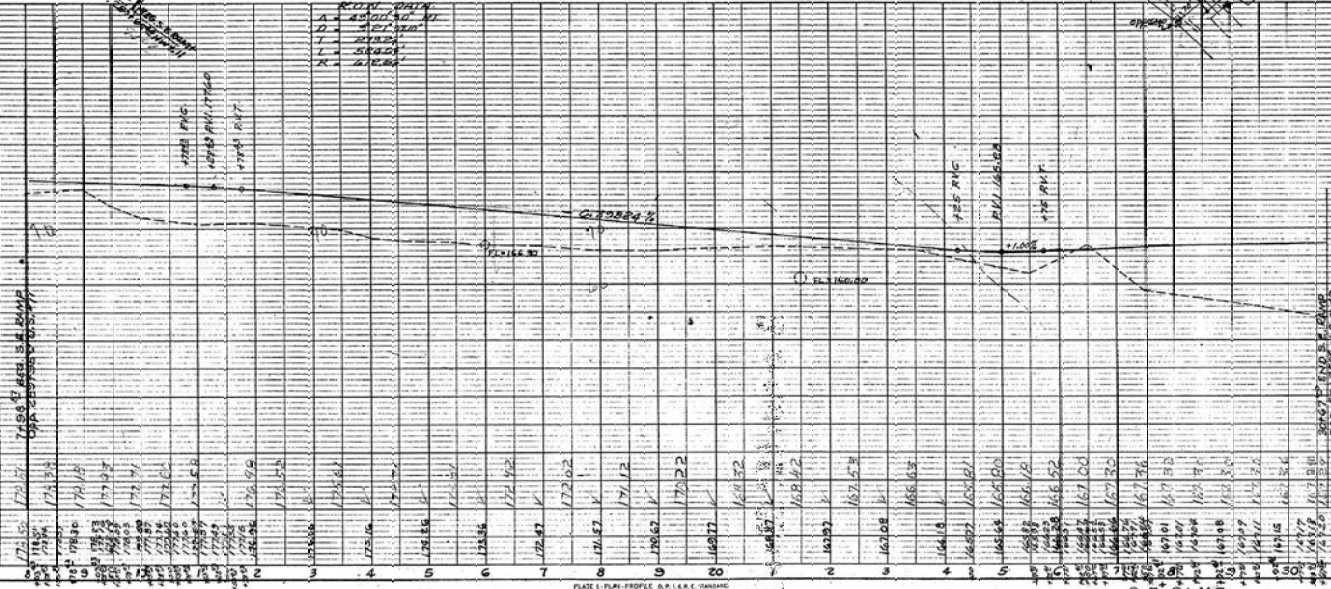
PLAN, PROFILE & L&L (L&L) DRAWING
